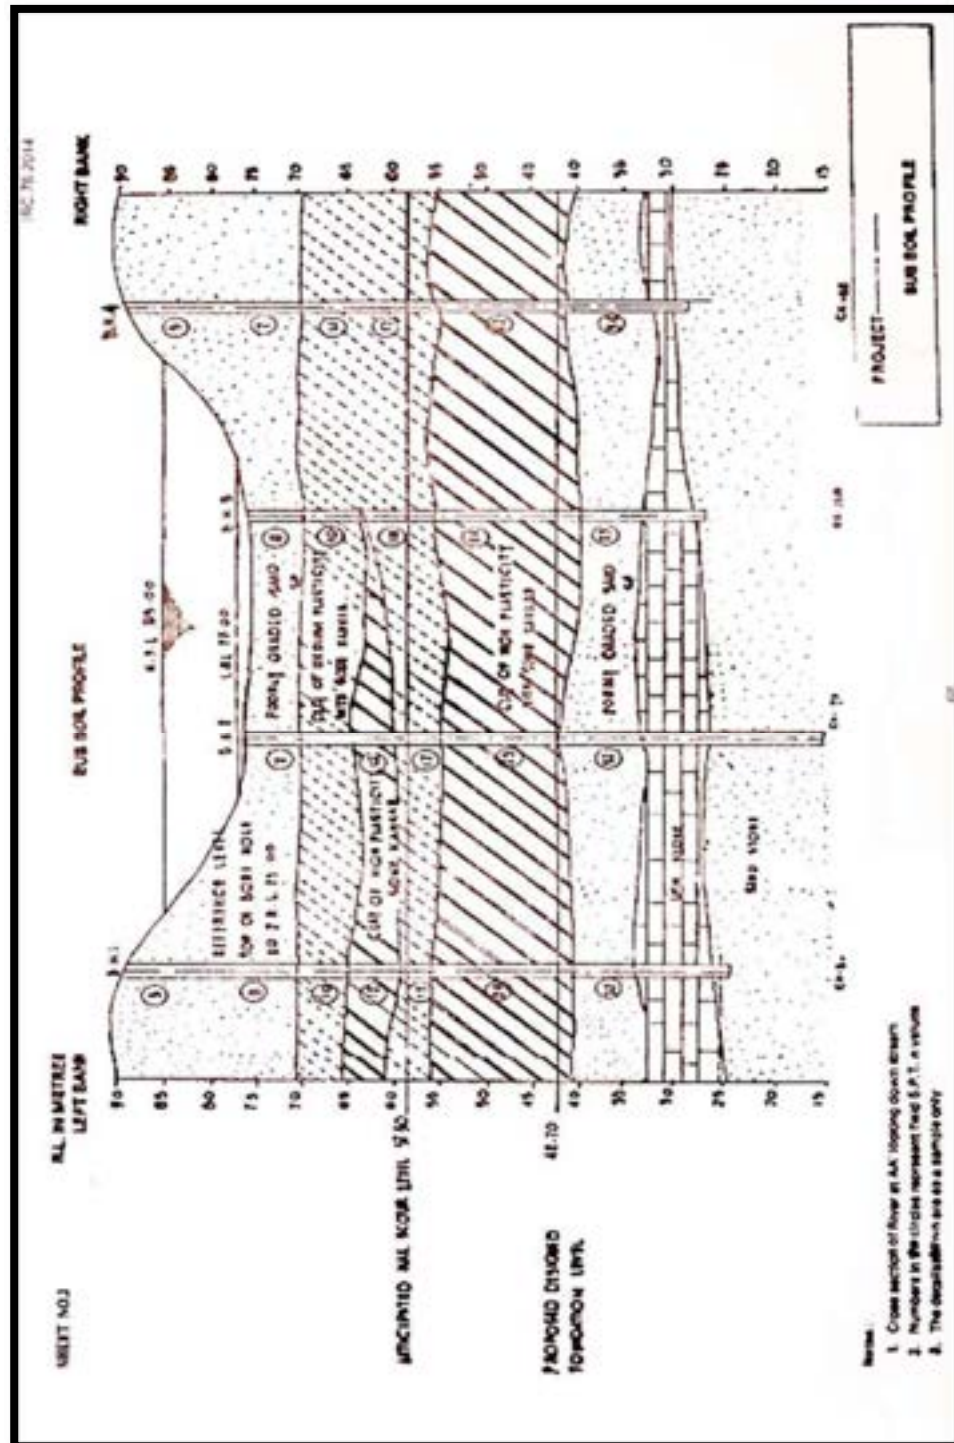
Typical Cross-Section indicating subsoil profile.
